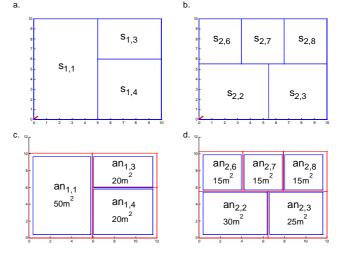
Test building before constraint resolution. a. First floor (schematic). b. Second floor (schematic). c. First floor (detailed), d. Second floor (detailed).
